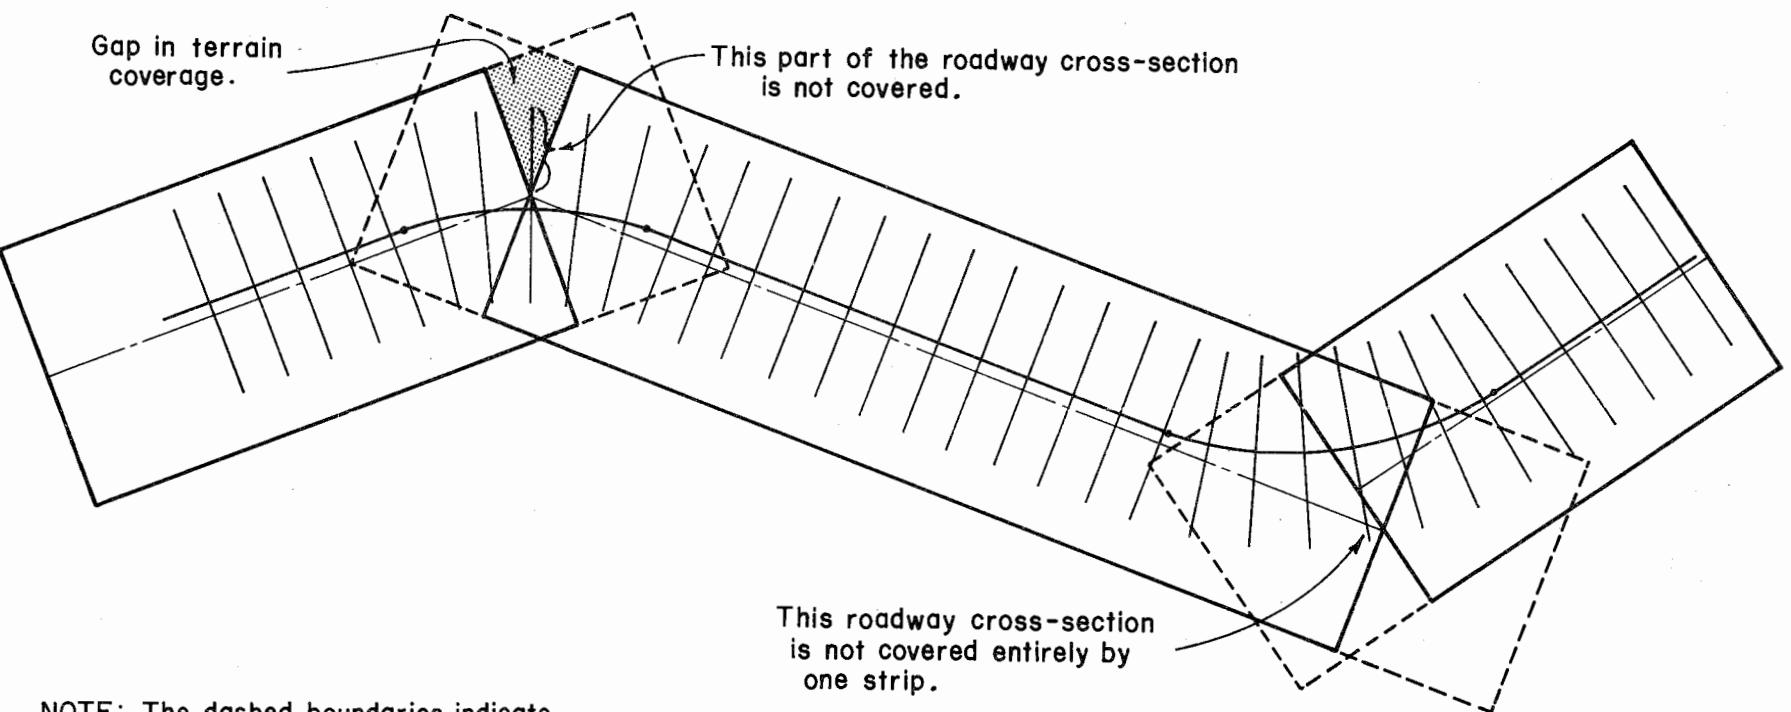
Flight Strip Overlap For Obtaining Roadway Design System Cross-Sections
